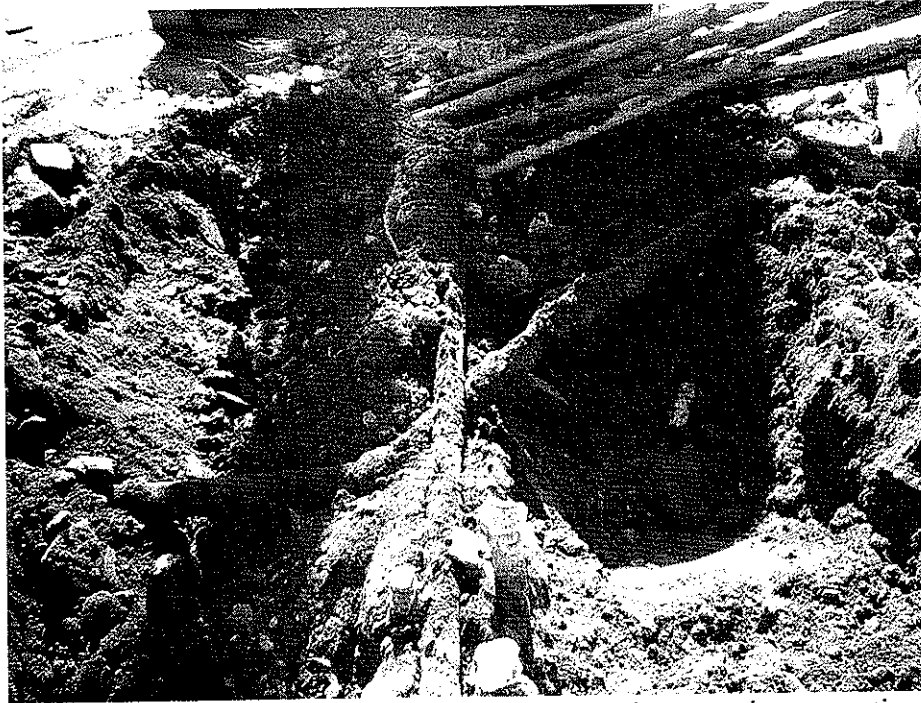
Fifth Street Test Pit. Note the pipe crossing over the excavation.
